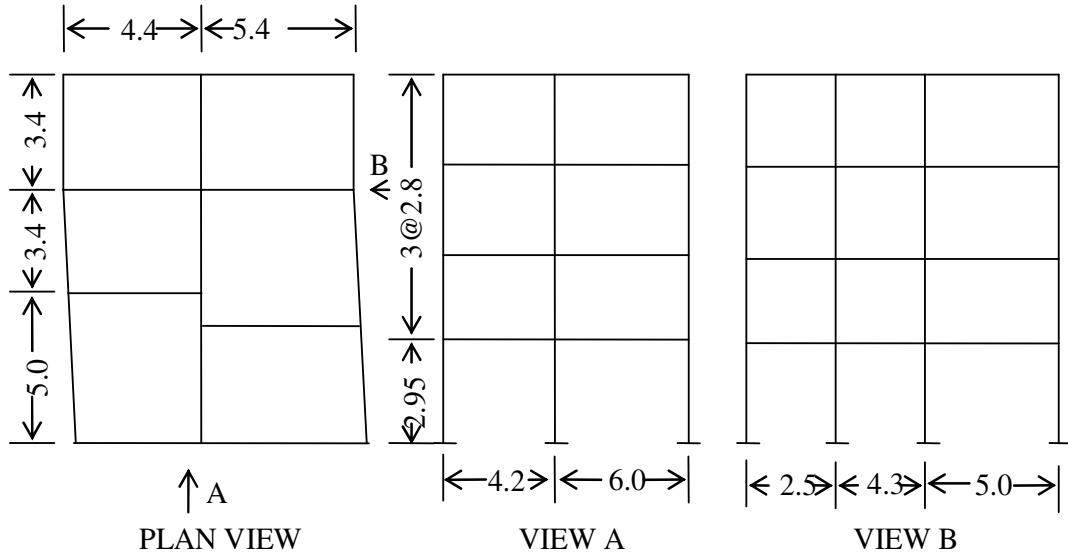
Selected Building Plan View and Profile Views (All units are in meters)
